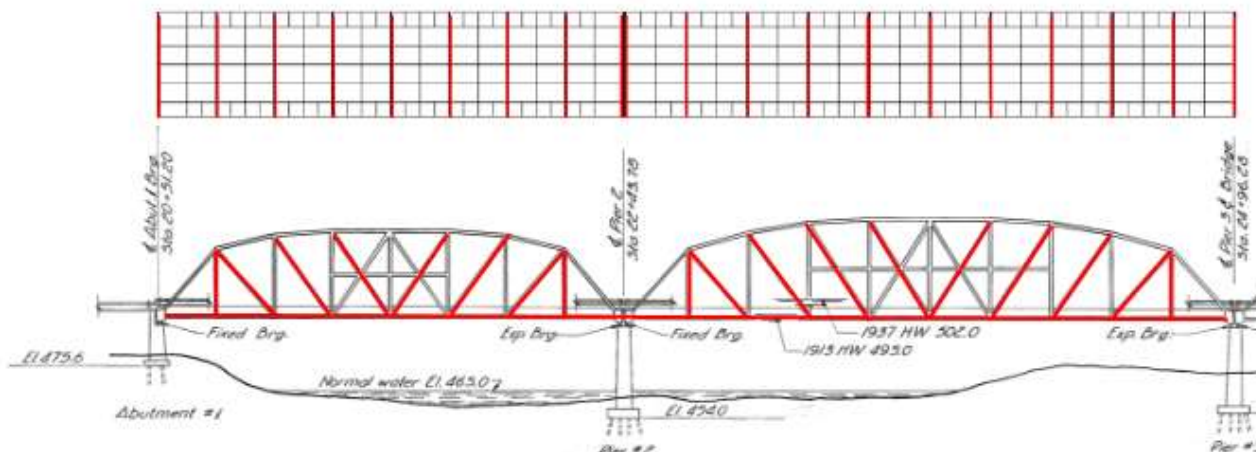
Partial south elevation of bridge with Spans 1 and 2 shown (Note the non-redundant steel tension members highlighted in red)
